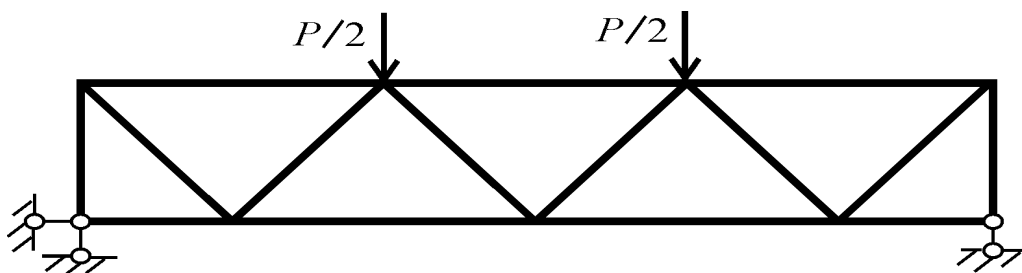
Structural design of welded truss and the scheme of its loading
